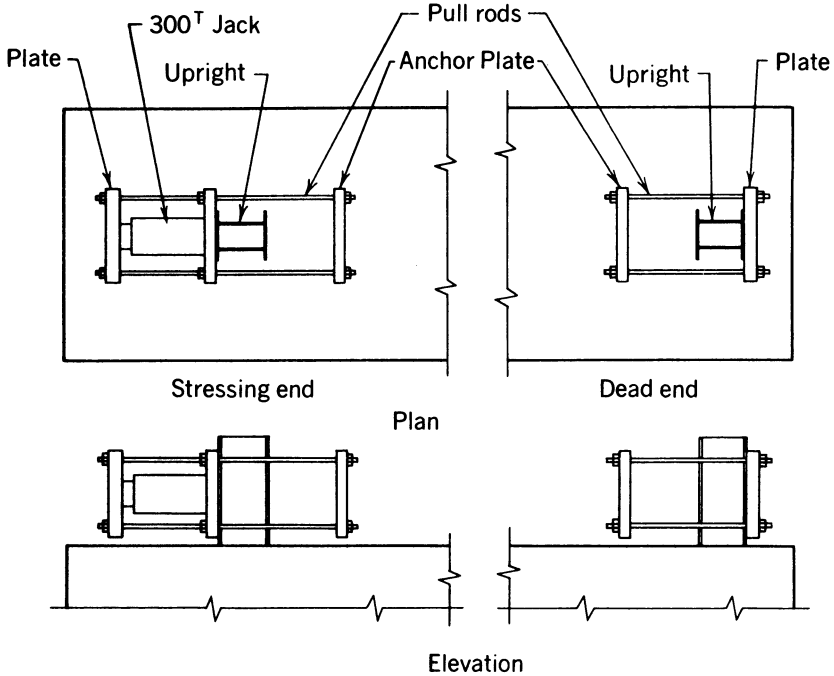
Pretensioning stressing mechanism, type 3.
